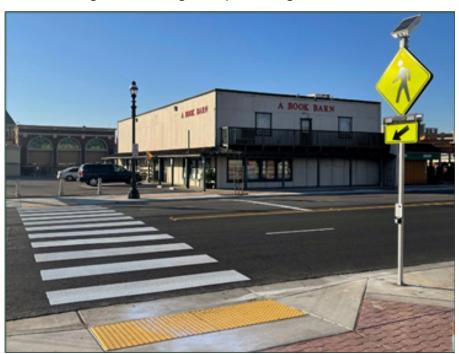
Rectangular Rapid Flashing Beacon (RRFB)
